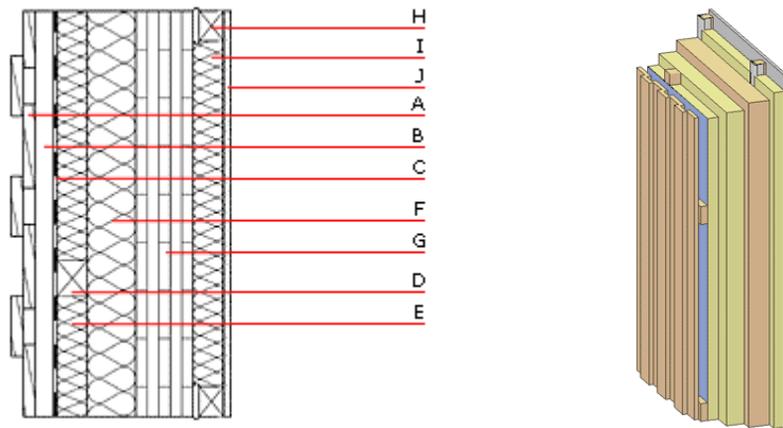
Cross-section of standard configuration and 3D view for external wall (dataholz.com 2017)
